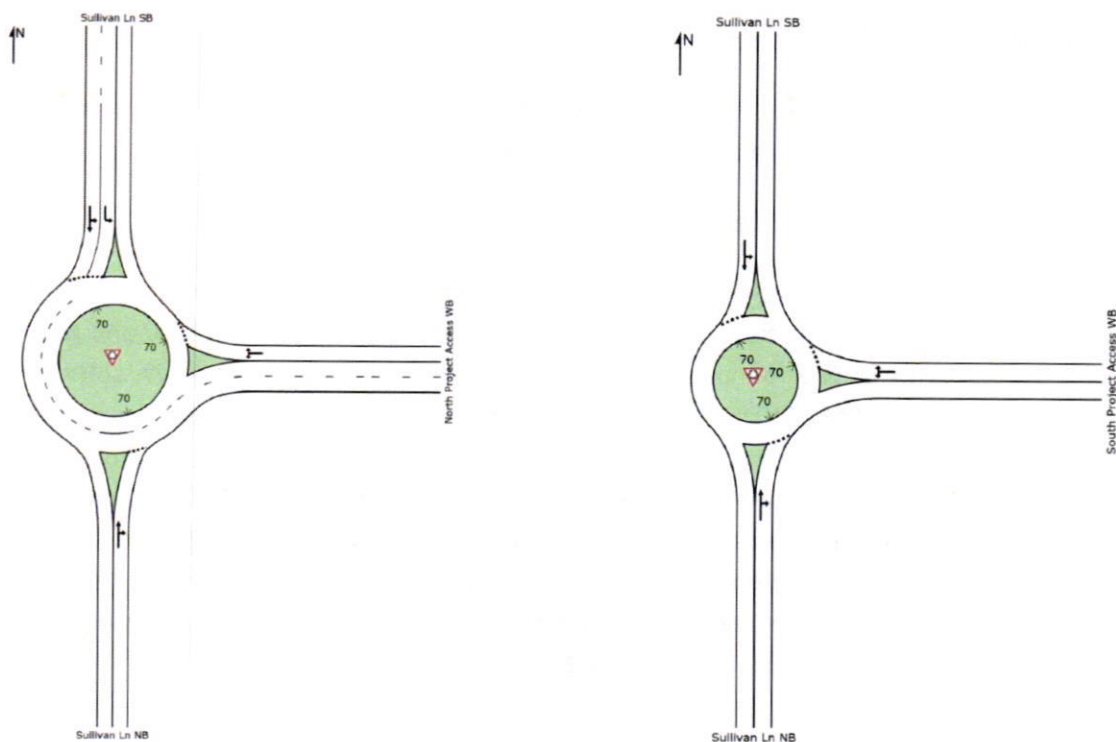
Proposed Roundabout Configurations – Project Access Locations
